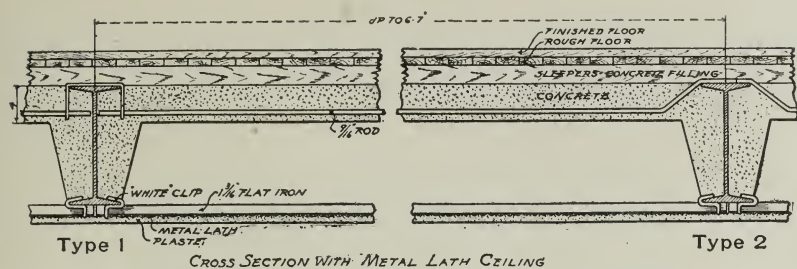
a. White Concrete Flat Floor Arch, System A.
